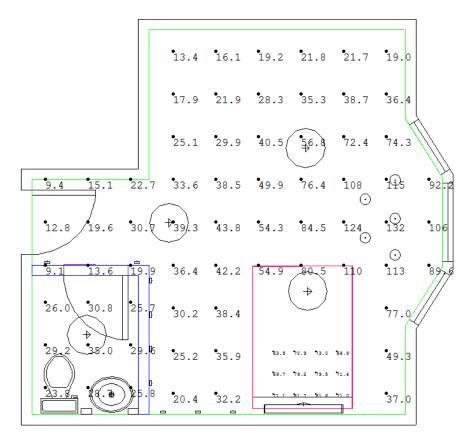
Improved Layout Illumination Levels with Three General Luminaires and All Restroom Luminaires "On"
